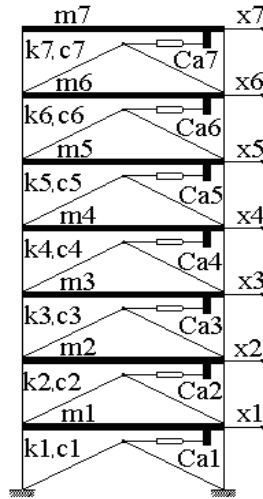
7-storey building structure with fitted additional fluid viscous dampers
